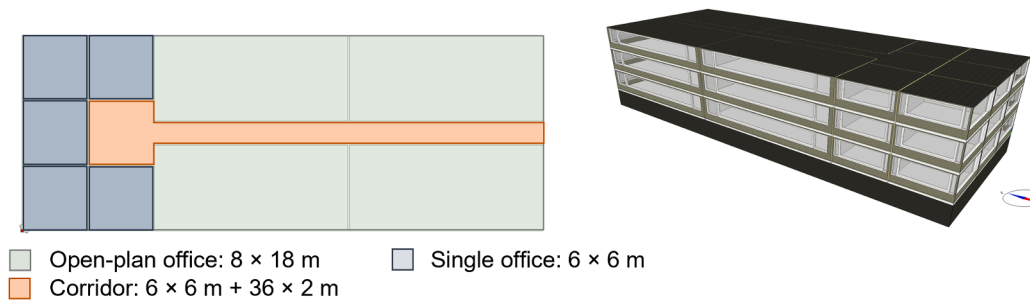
Floor plan with zoning (left) and 3-D representation (right) of the office building.
